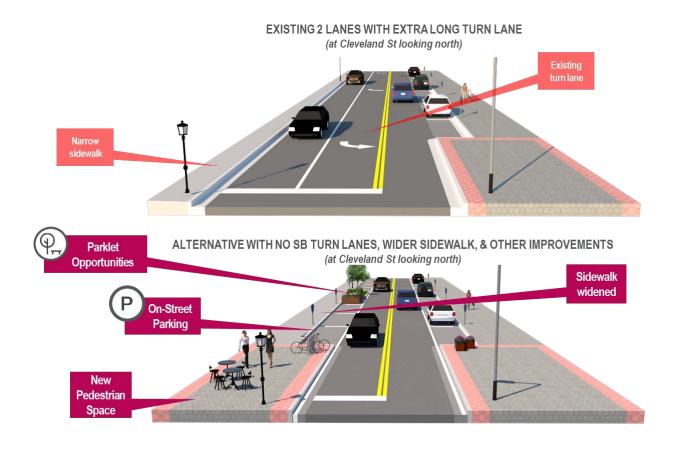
Existing and Proposed Typical Section North of Cleveland Street
